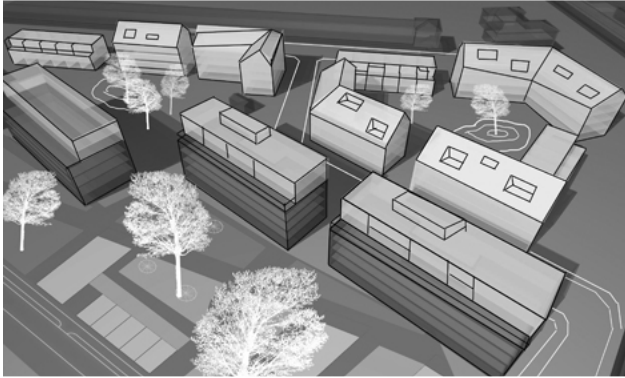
New buildings, in-fill construction within the block structure and additional storeys to existing buildings in Kasarminmäki suburb, Kouvola [25]
